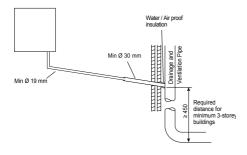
Connection of Condensate Drainage to Drainage and Ventilation Pipe
